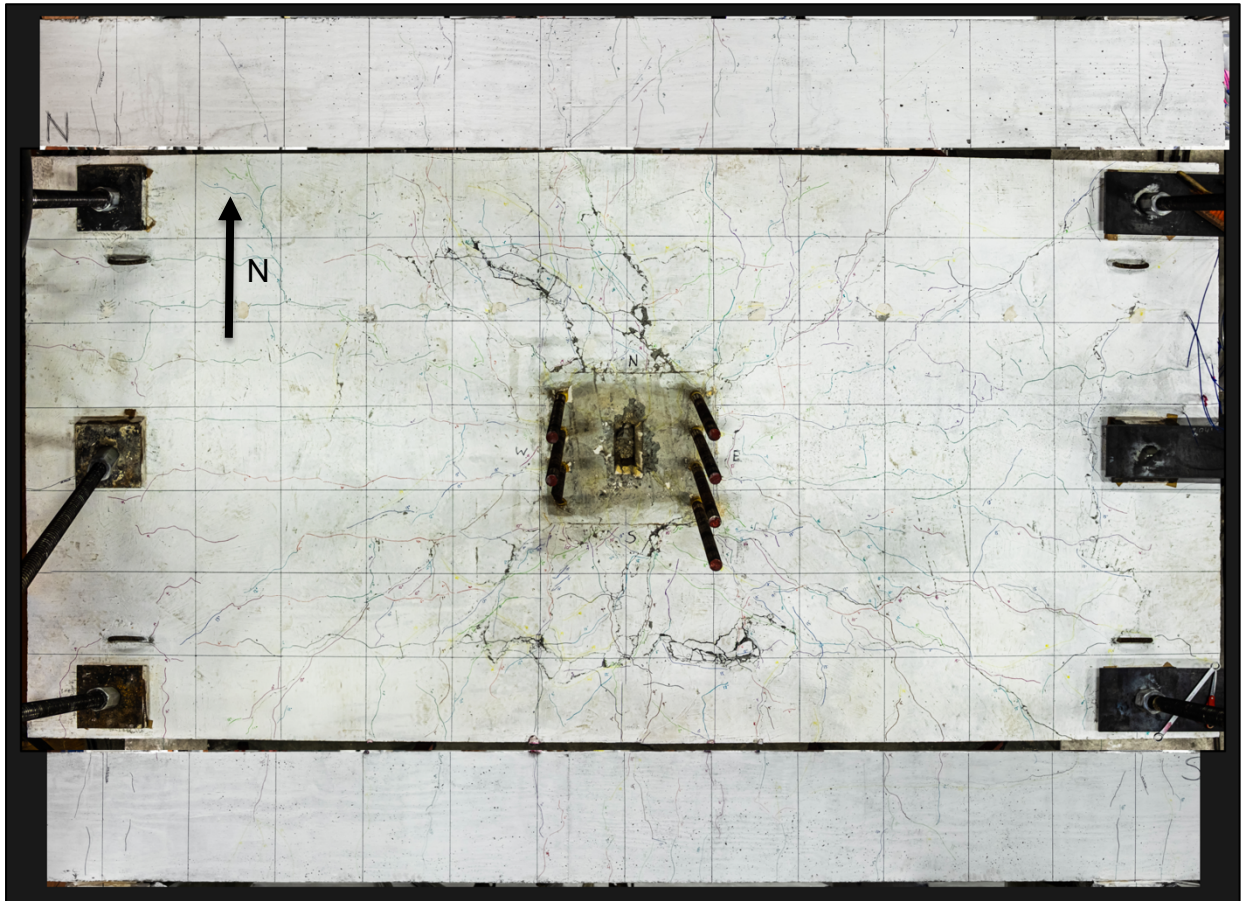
Specimen crack pattern after failure, 12 in. x 12 in. grid, top view and two lateral unfolded views
